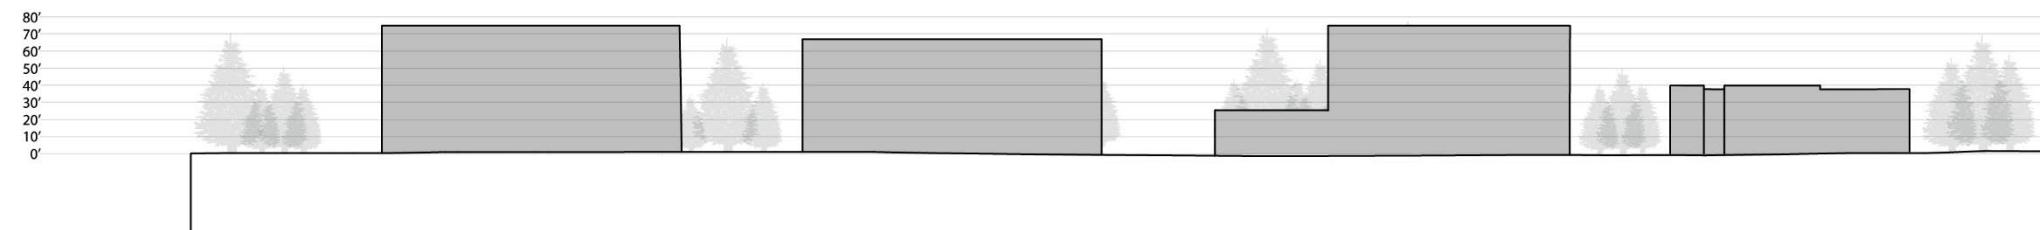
Elevation Views for Alternative 2—Varied Height and Form
